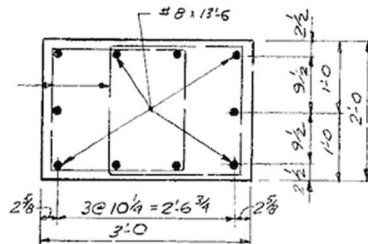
Typical Cross-section of Column for Bridge (NBI 14650) (1964)
